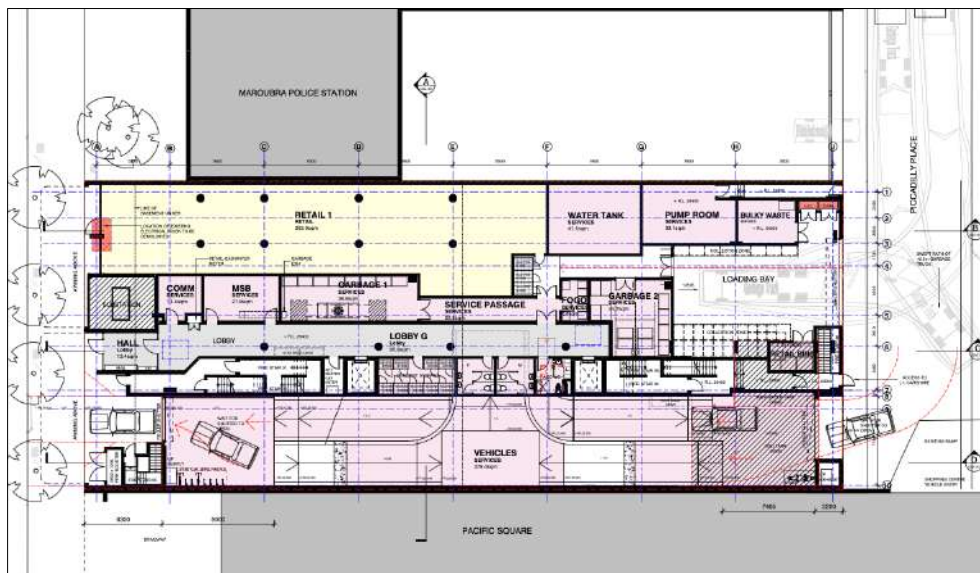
The floorplan of the ground floor, illustrating residential and commercial entry points, amenities and parking ramp. DJRD Architects, 2025.
